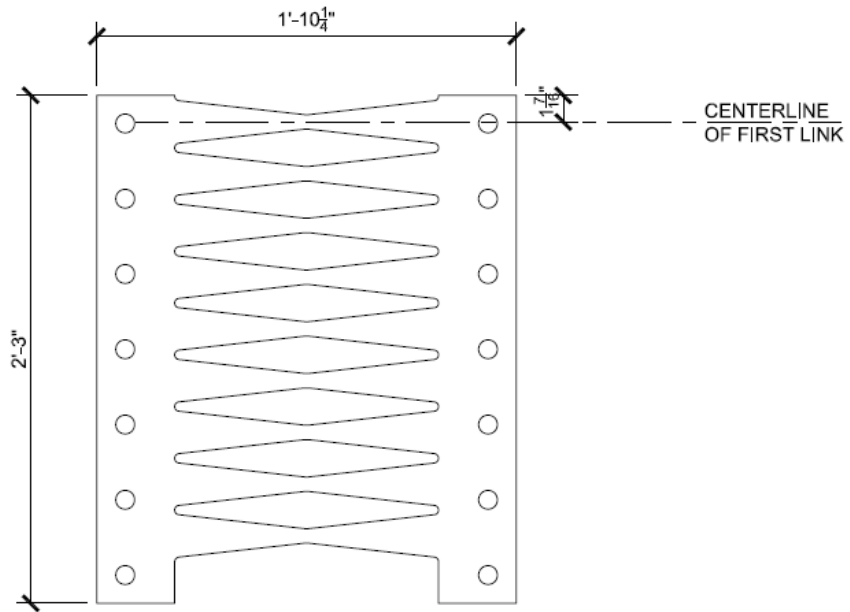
Specimen Design Drawing – Fuse for Test A3 Alternate
